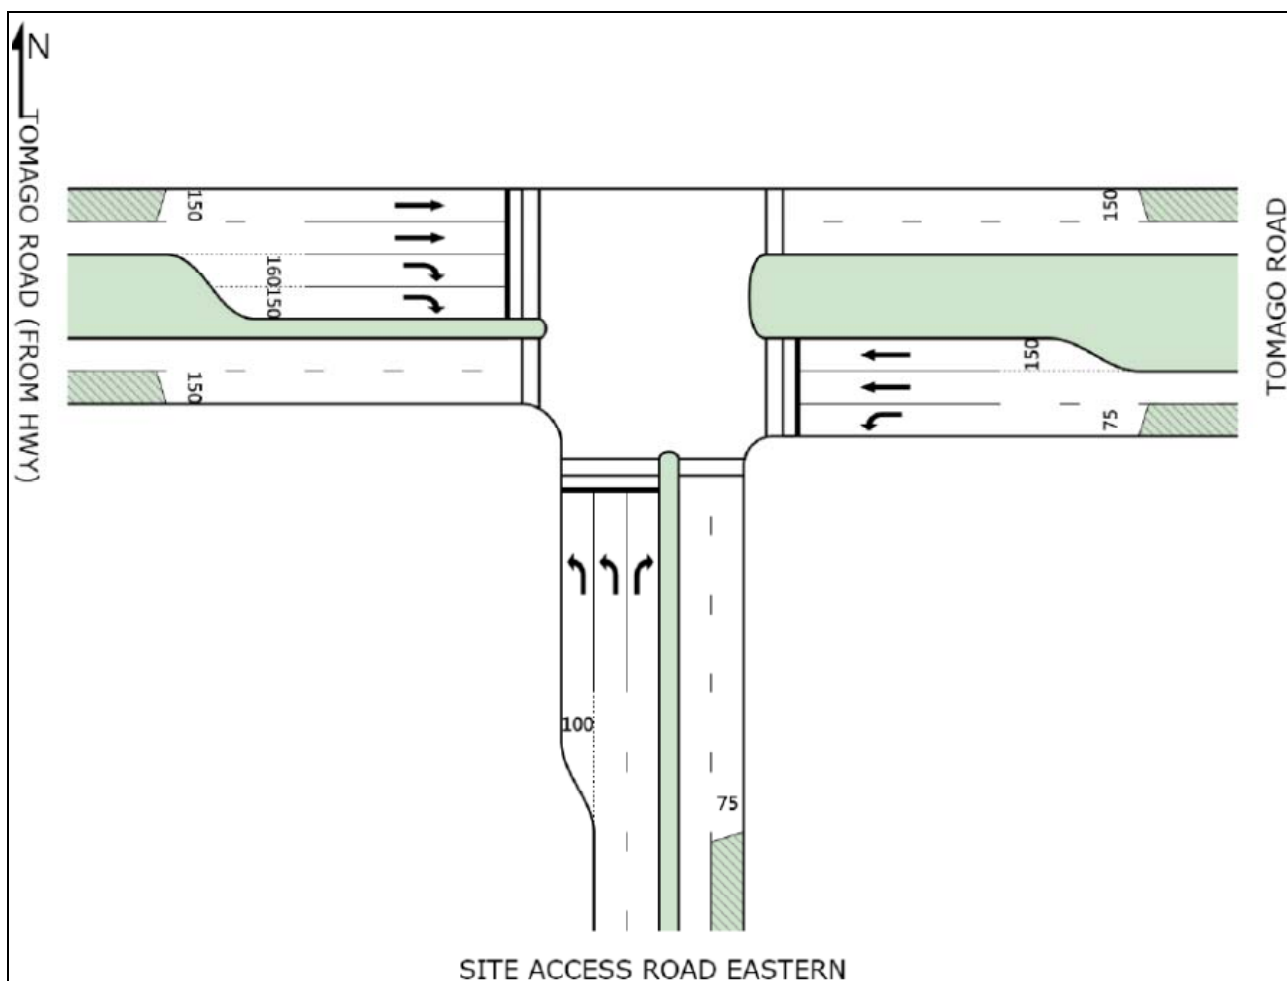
SIDRA Geometric Layout, Eastern Intersection (WesTrac Drive).
